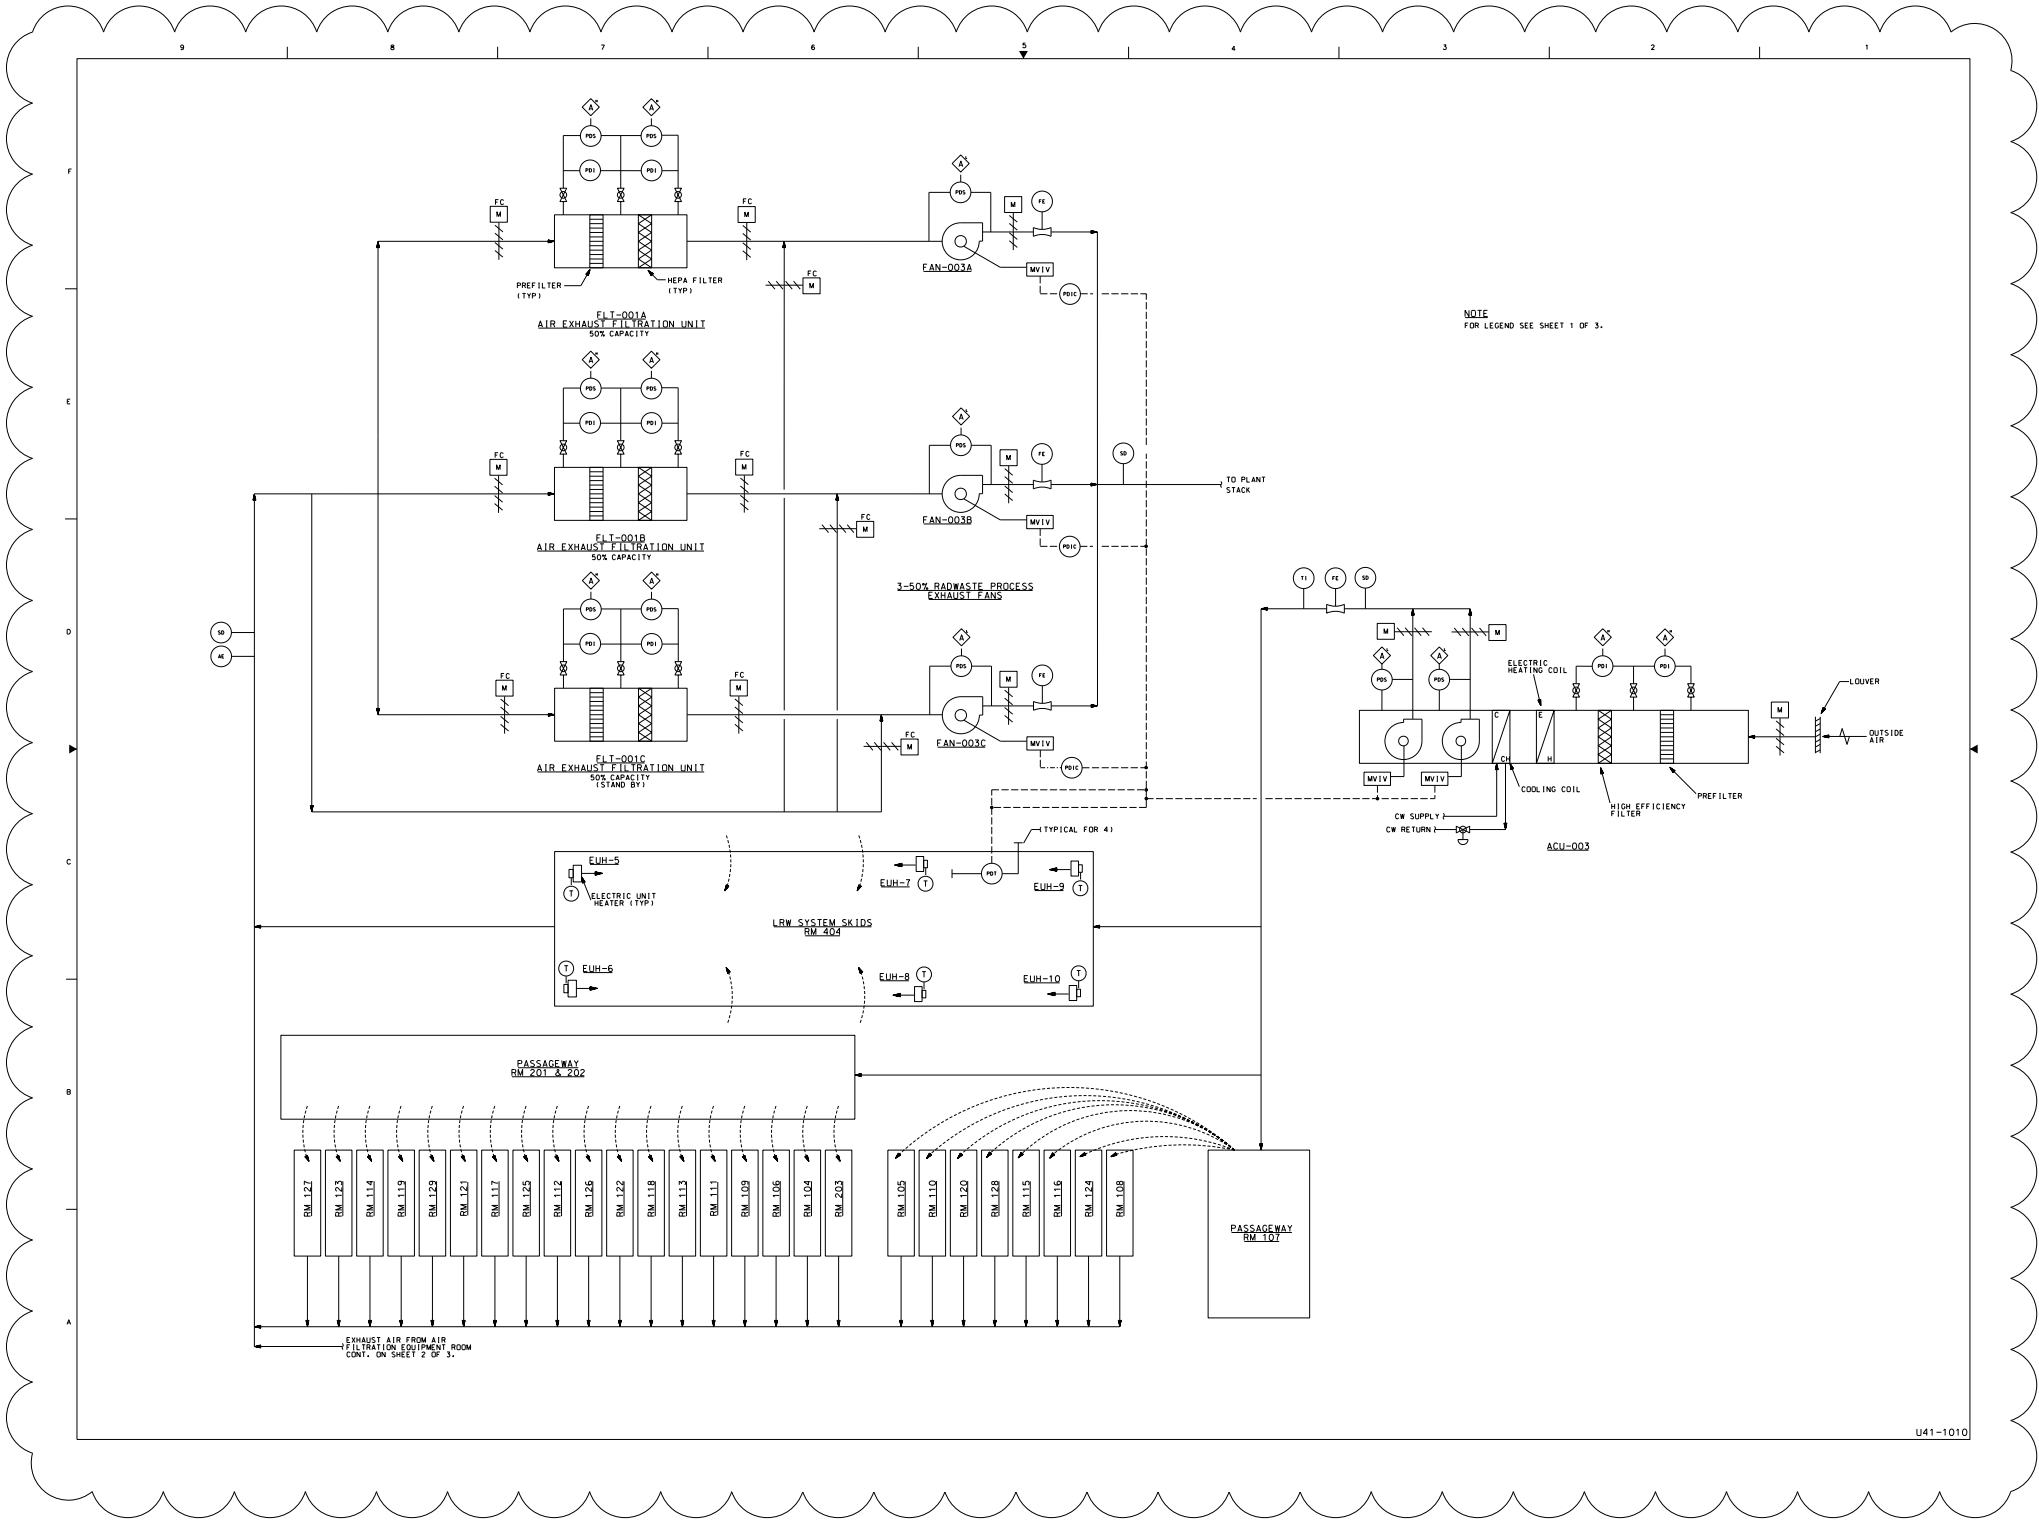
Radwaste Building HVAC P&ID (Sheet 3 of 3)
